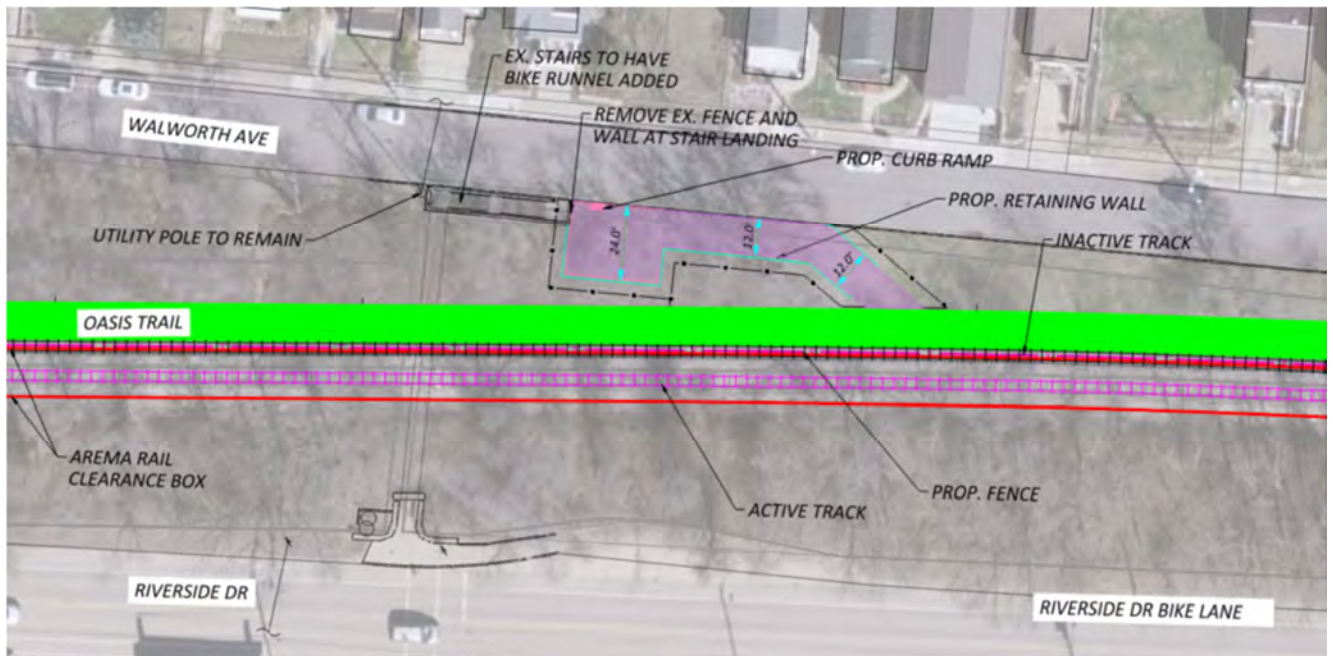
Preferred Walworth Tunnel Pedestrian Access Point
